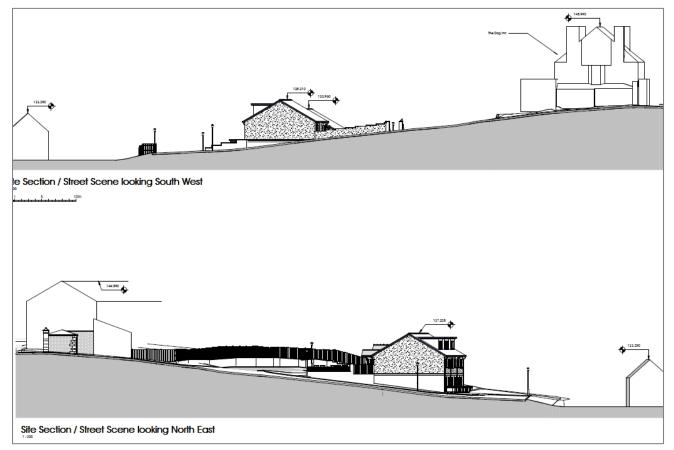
Site sections showing the new dwellings in relation to the Dog Inn and adjacent houses at lower level
